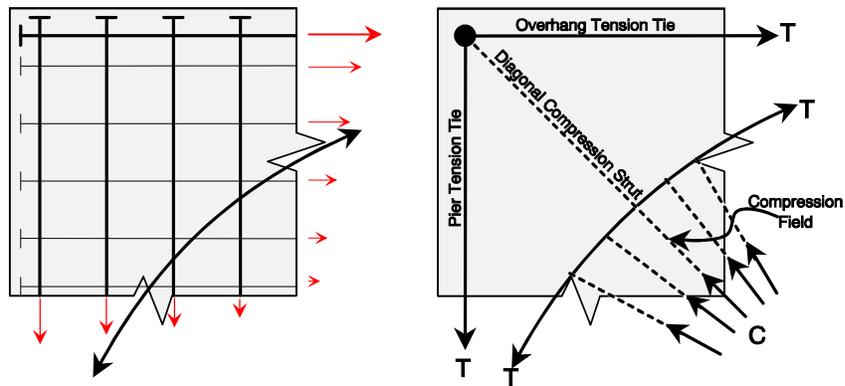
Joint corner detail for Specimen POJ-PU-74-TH
